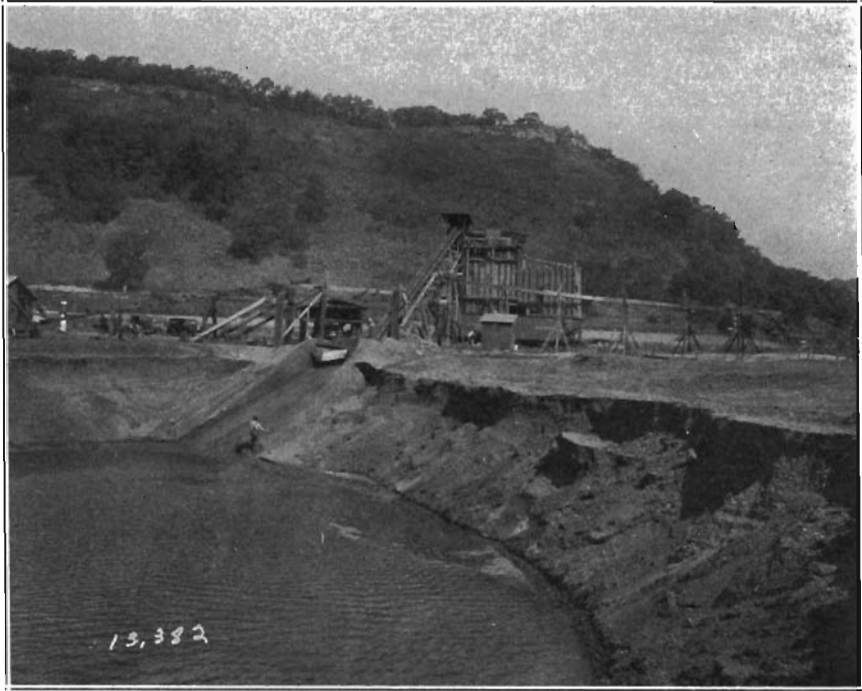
Northeast Iowa Sand and Gravel Co., Harpers Ferry. General view of the plant showing excavation by cableway dragline.
